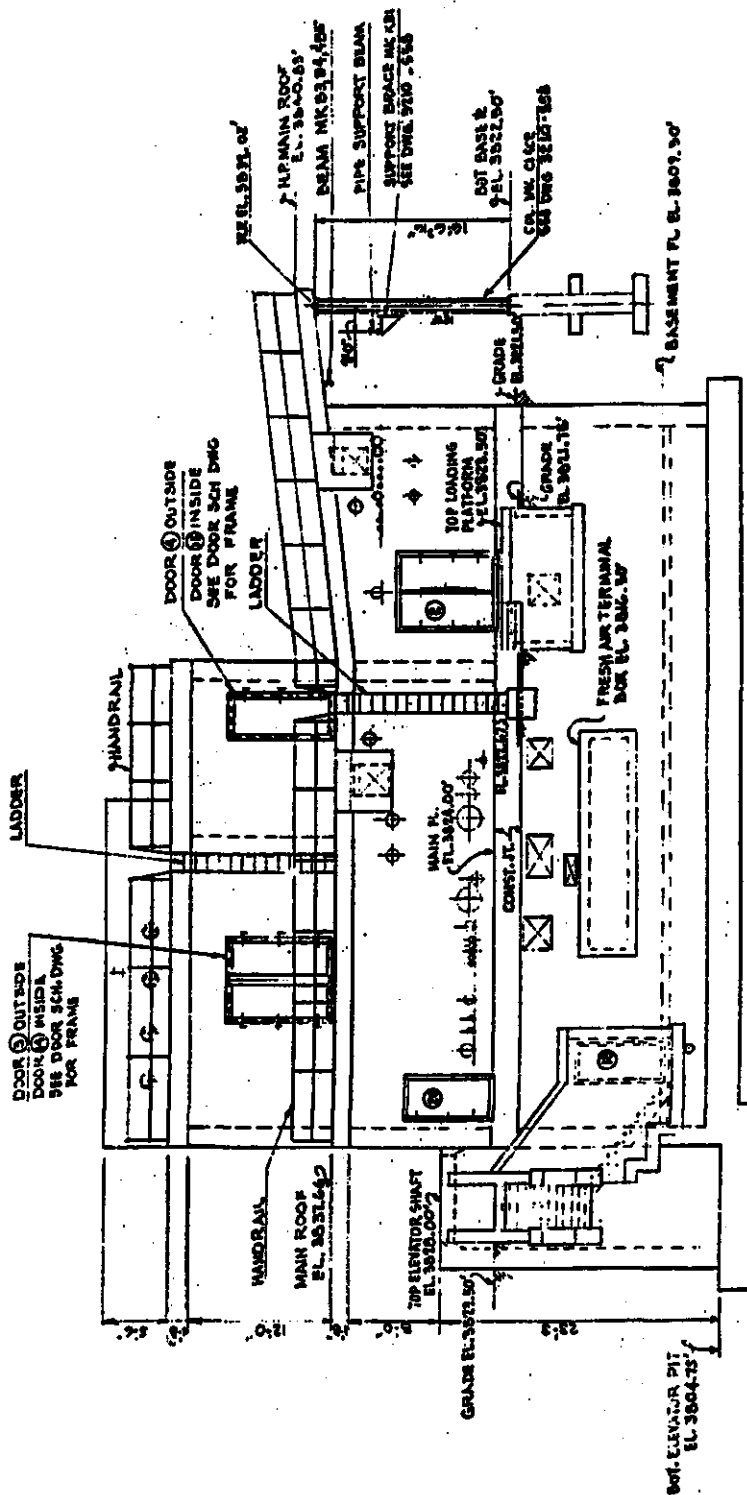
Test Cell C, Building 3210, south elevation, ca. 1960.
